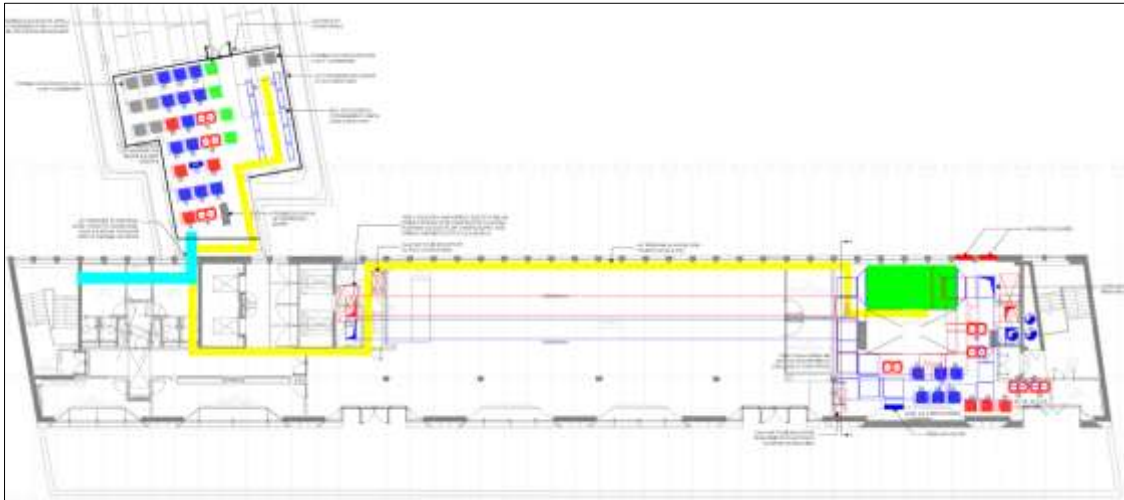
Building services plan showing Level 7 roof plant area (top left) and Level 8 plant room (far right)
